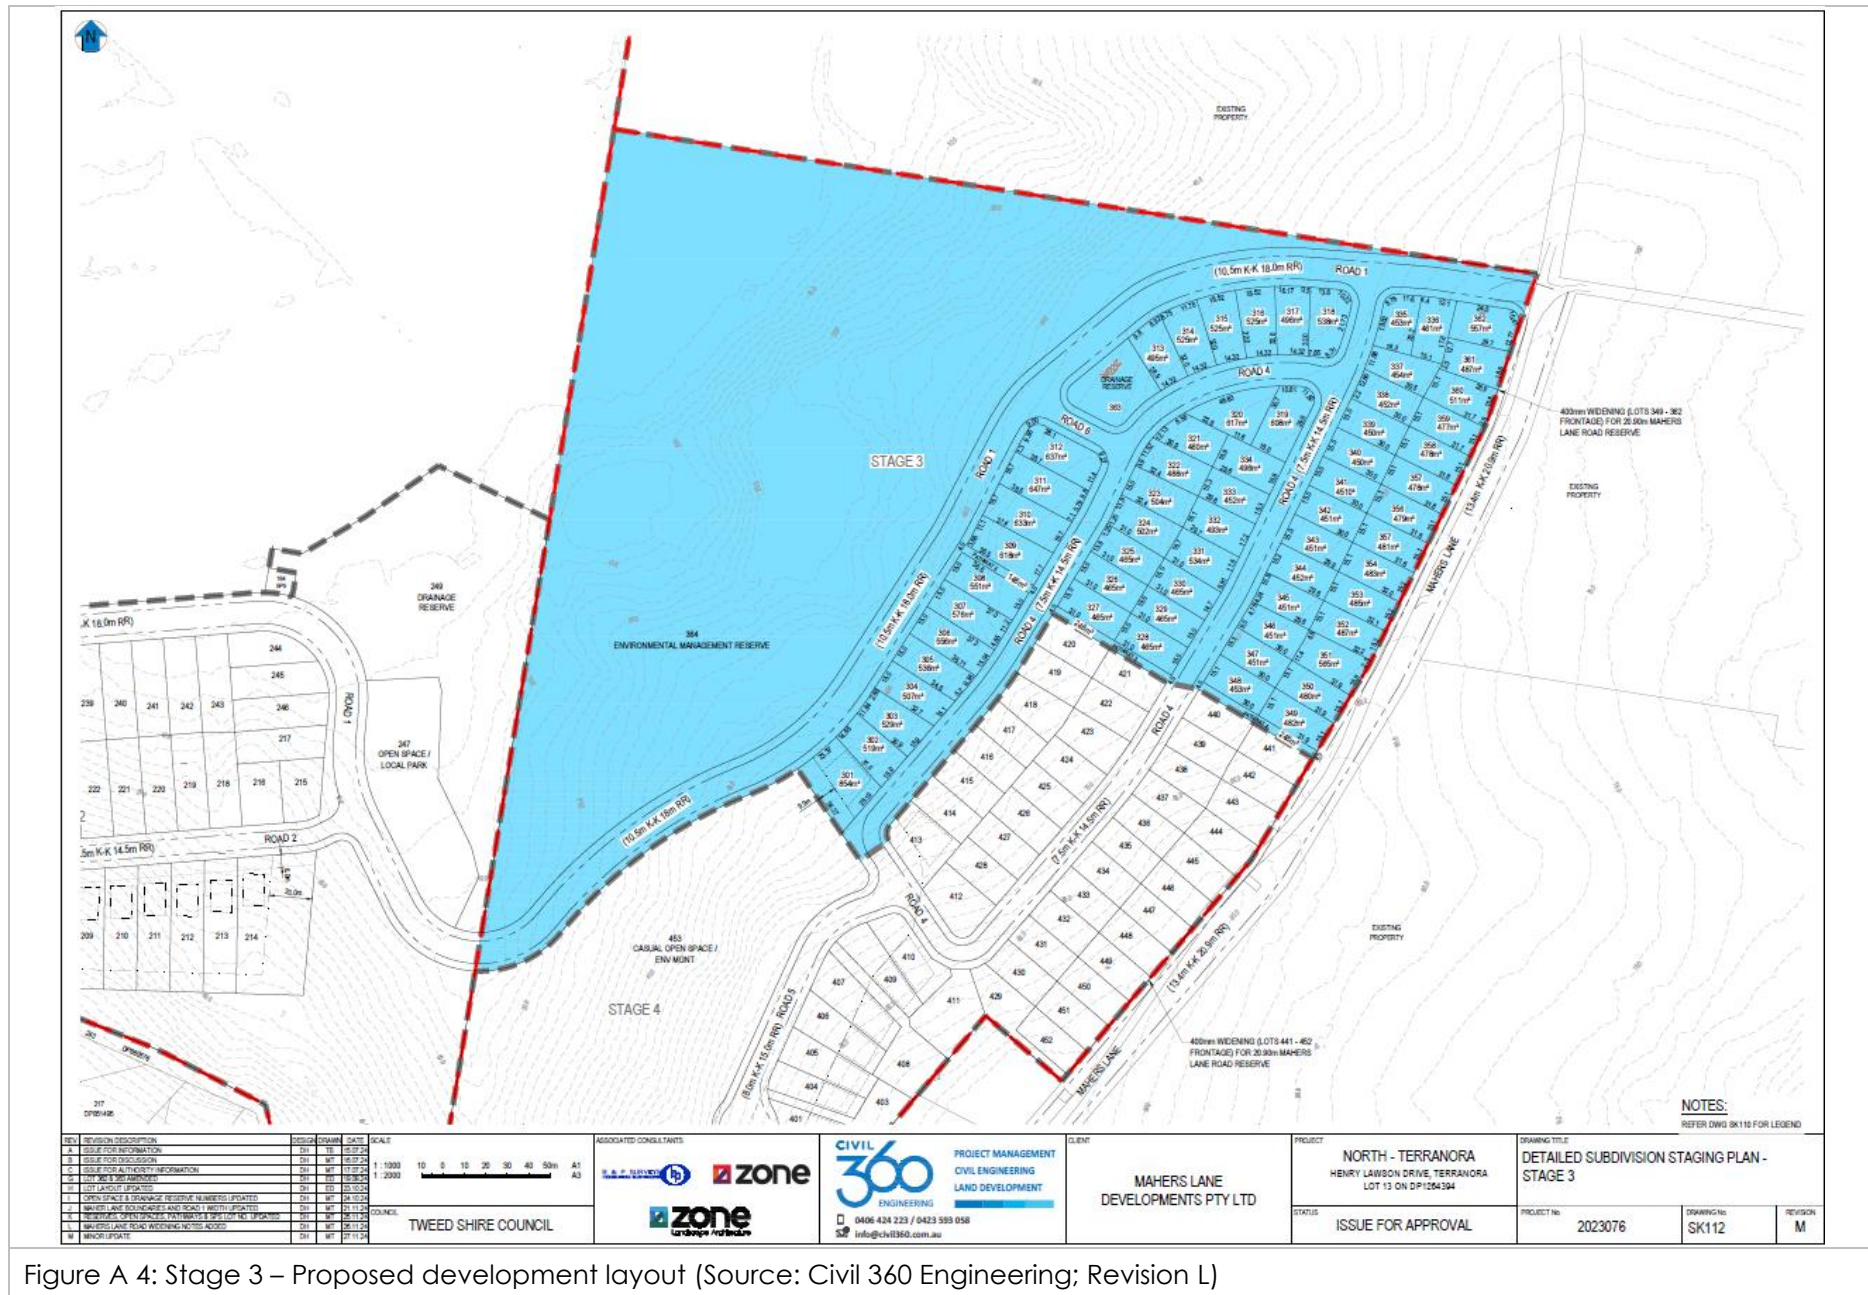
Stage 3 – Proposed development layout (Source: Civil 360 Engineering; Revision L)
